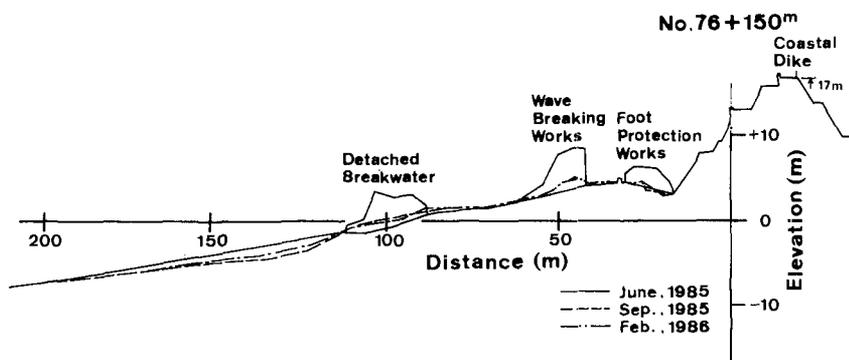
Cross section of the beach passing through the center line of No.17 detached breakwater.
